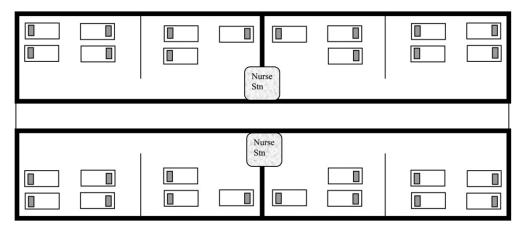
Bay Ward Arrangement (Yau et al 2011)
